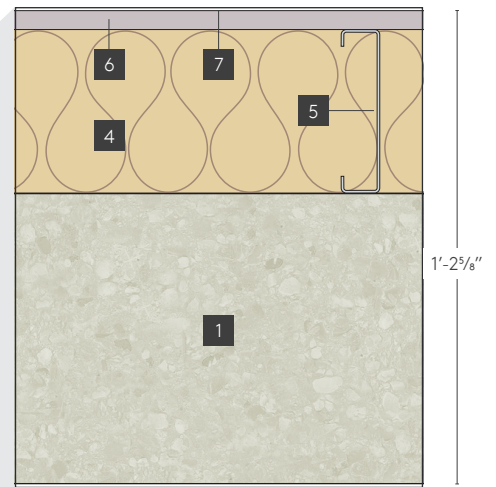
Tilt-up concrete wall assembly with fiberglass batt insulation and internal lining.
